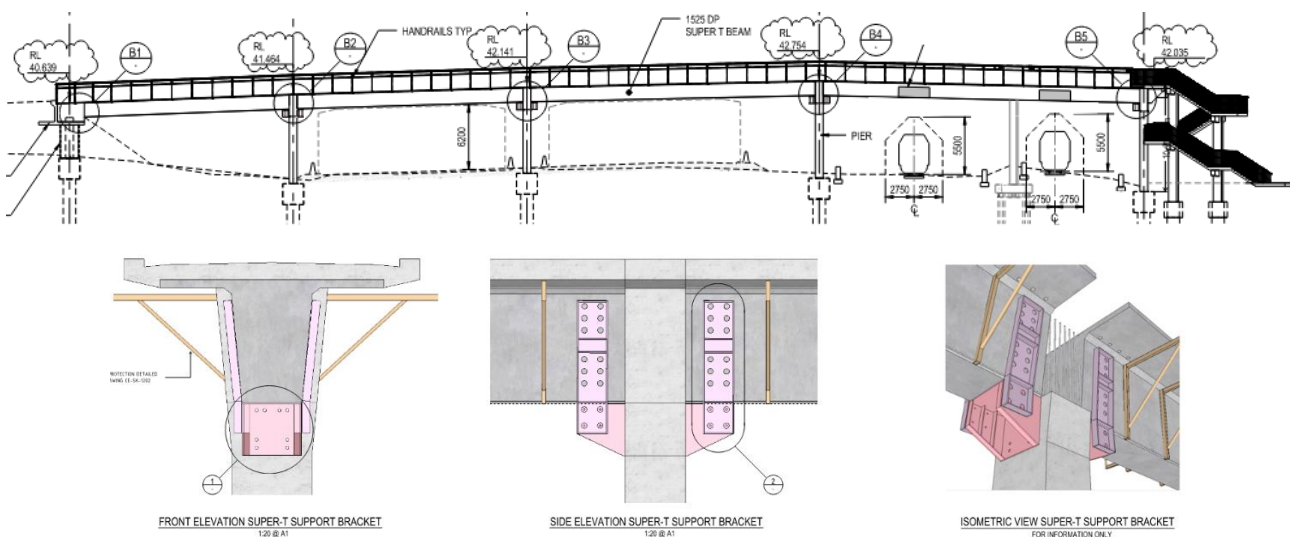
Elevation of the bridge and conceptual details of the temporary works supporting the girders.
